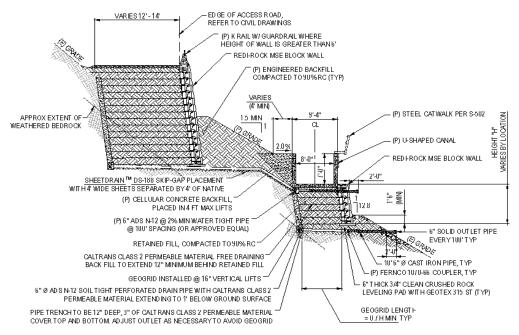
Typical Cross Section of Concrete Canal and Access Road
